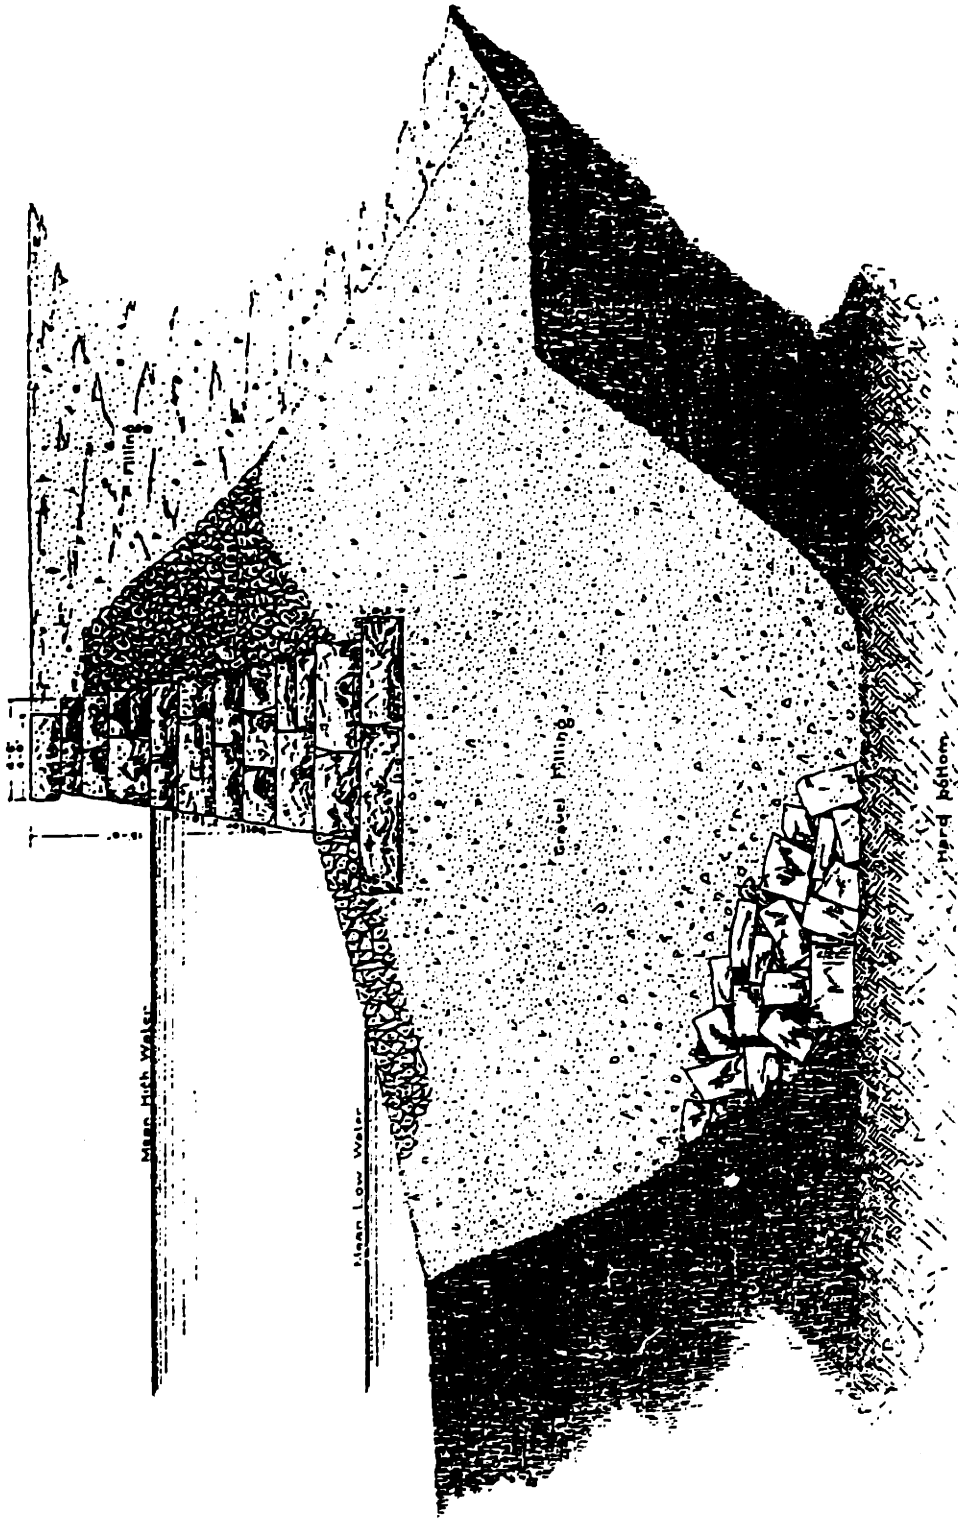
Typical Cross-section of Seawall 'D' (City of Cambridge Park Department, 1897)
